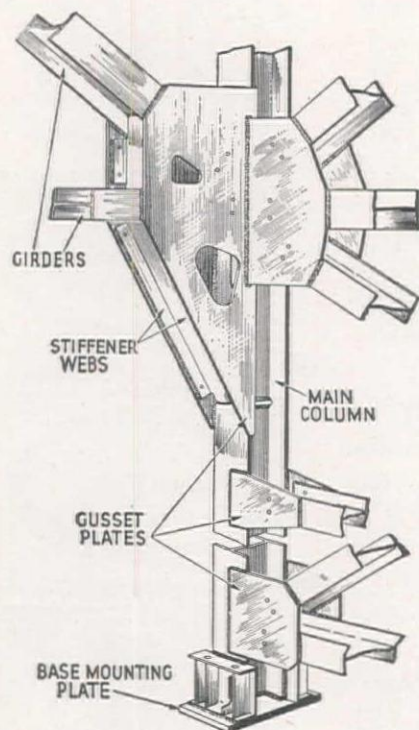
Construction detail of main column at base foundation showing welded assembly of girders to column.
